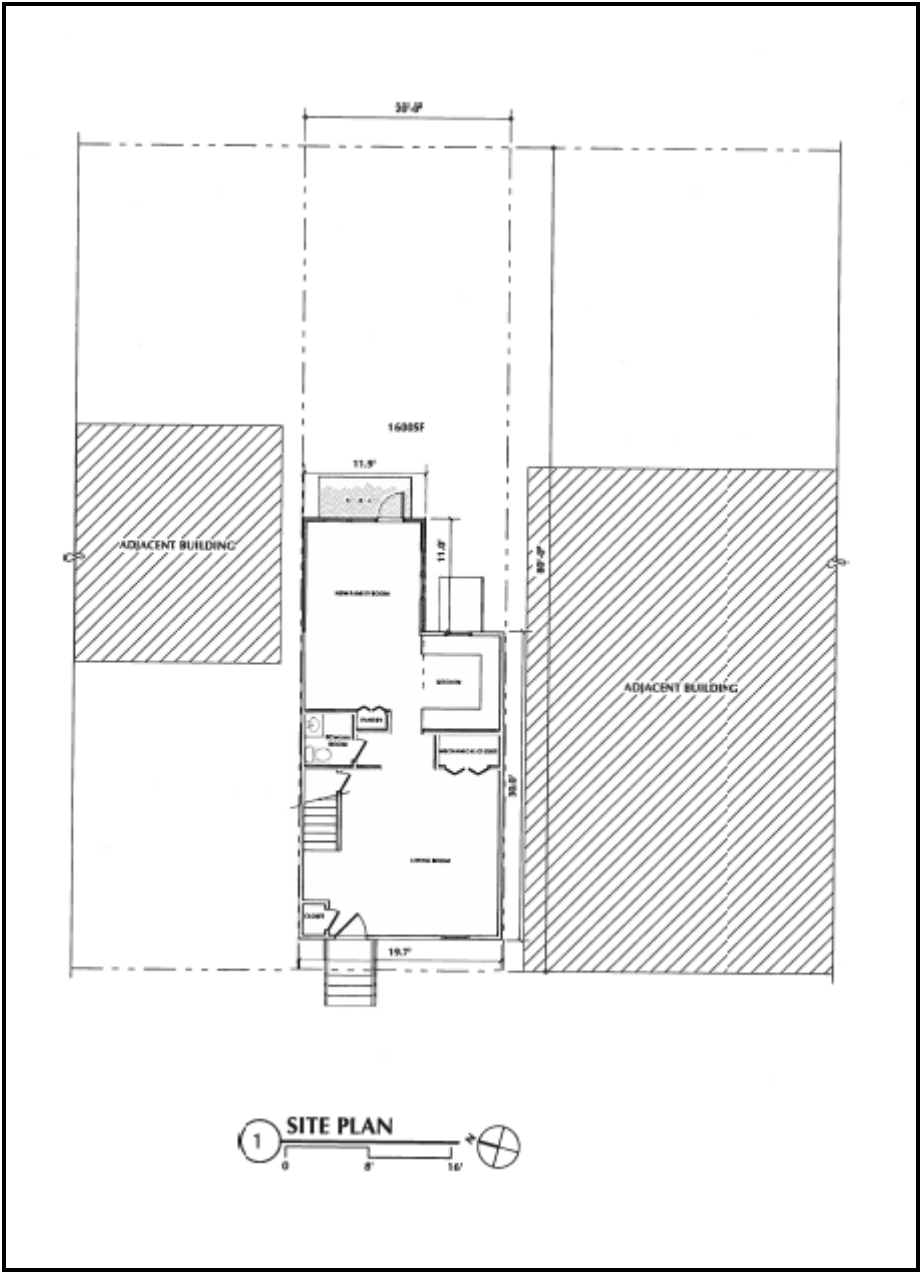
Site Plan showing location of proposed two-story addition and flanking buildings
